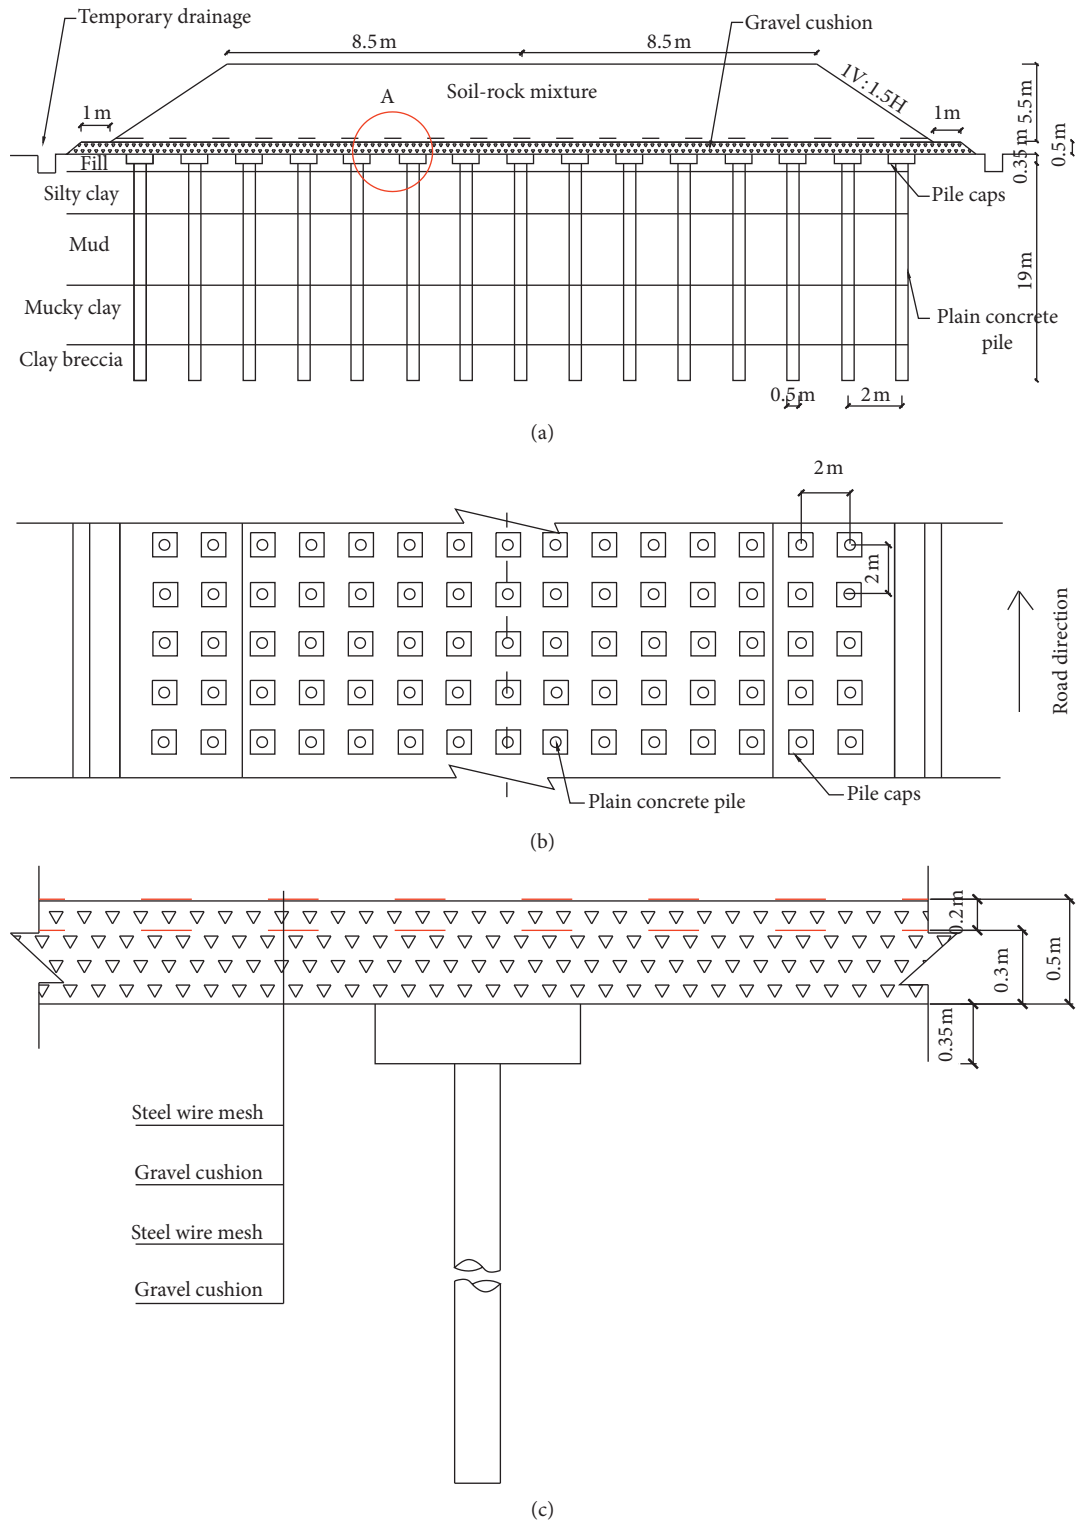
Embankment design and pile foundation reinforcement: (a) typical section diagram of soft foundation treated by plain concrete piles, (b) pile foundation plan layout, (c) detailed A section in (a).
